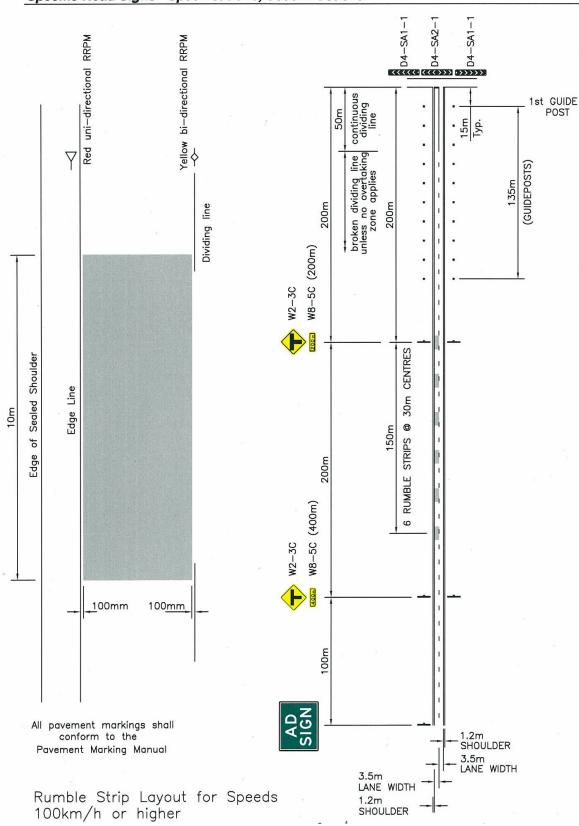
Layout of Rumble Strips on a T-Intersection
